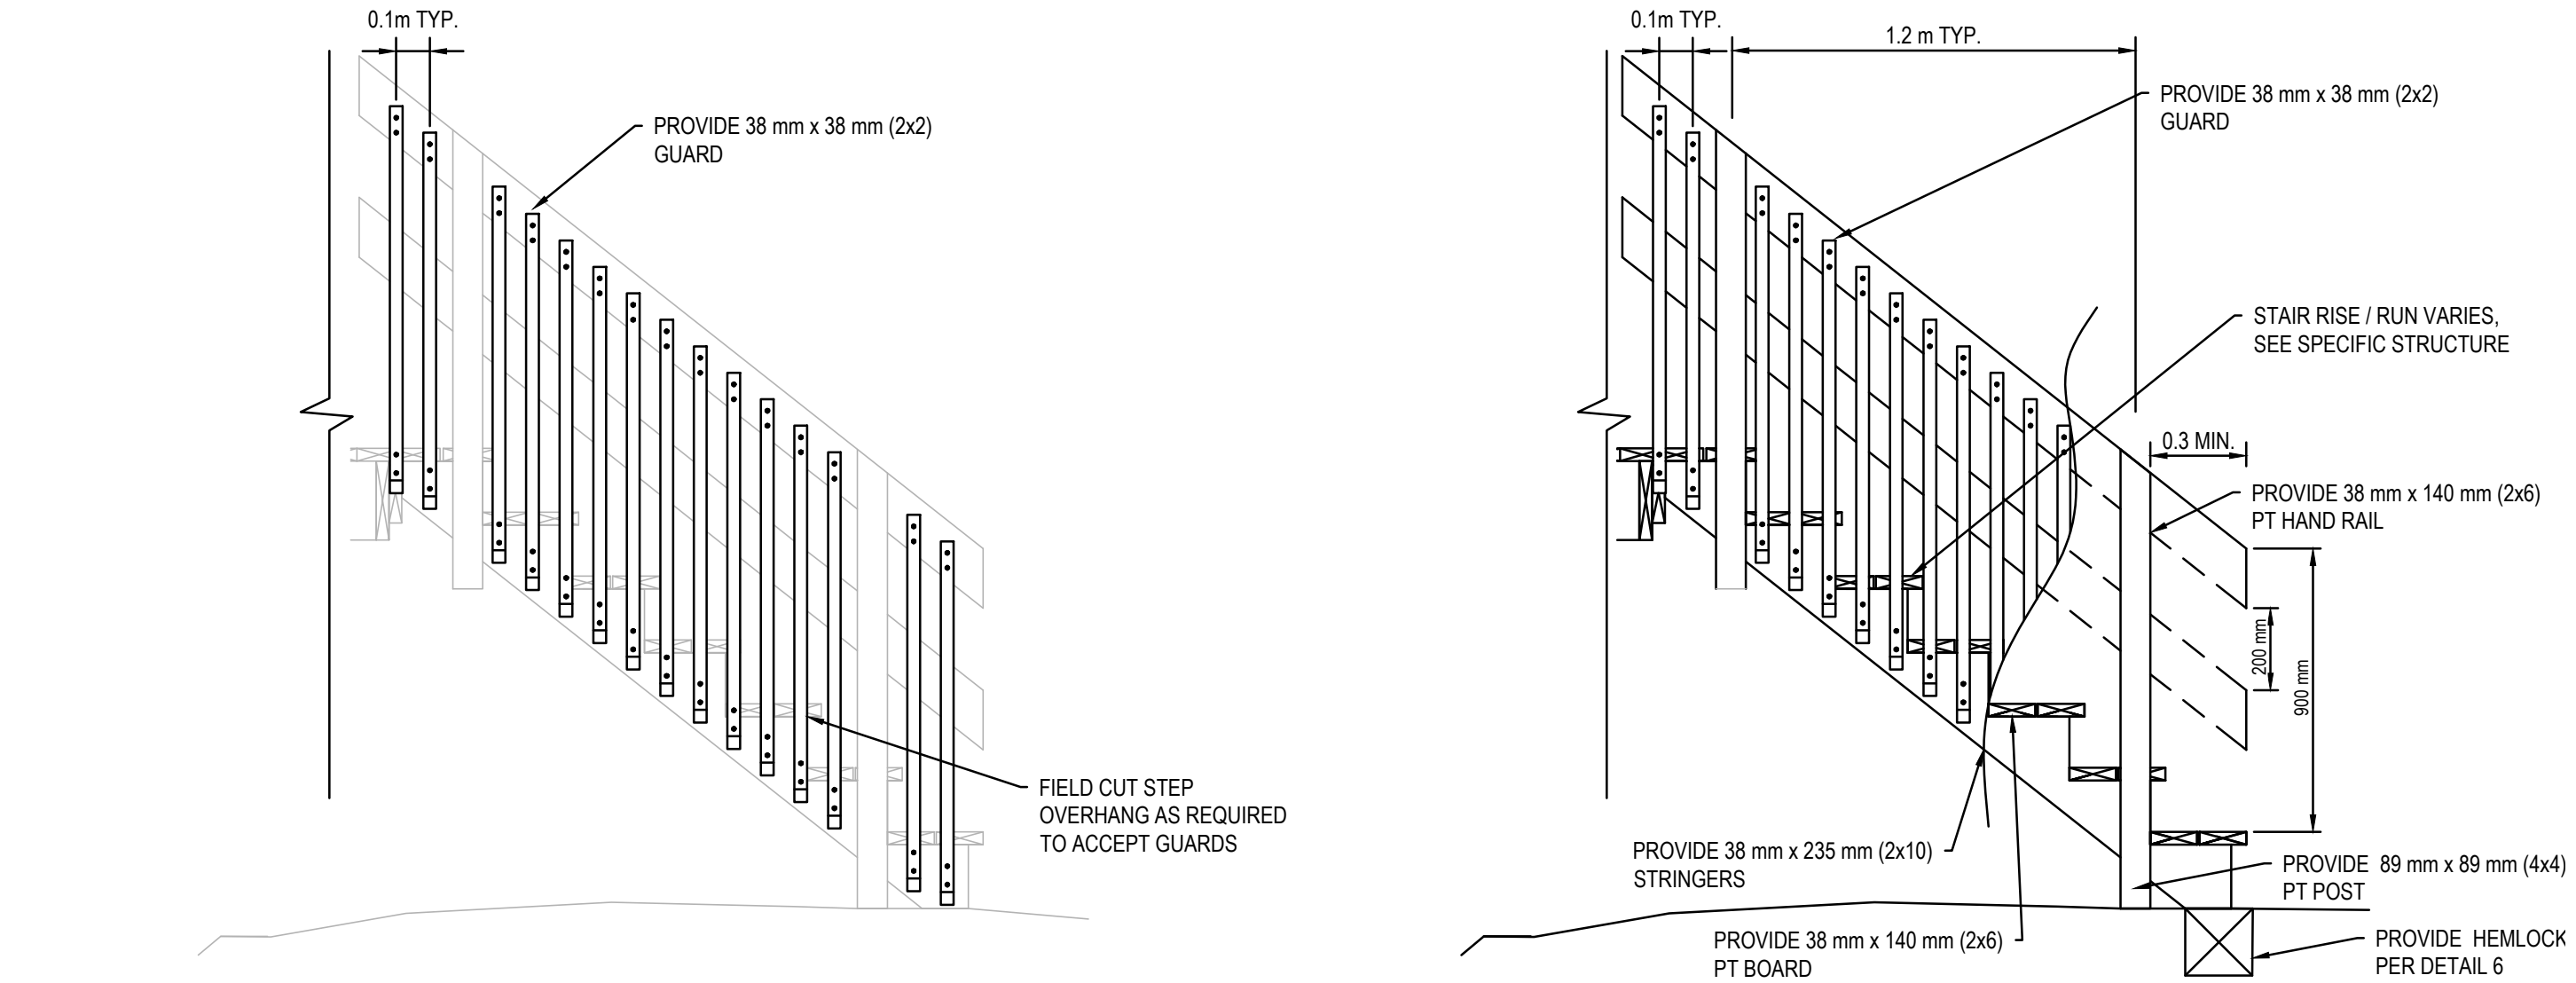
TYPICAL STRUCTURE POST, RAILING, AND GUARD SYSTEM
